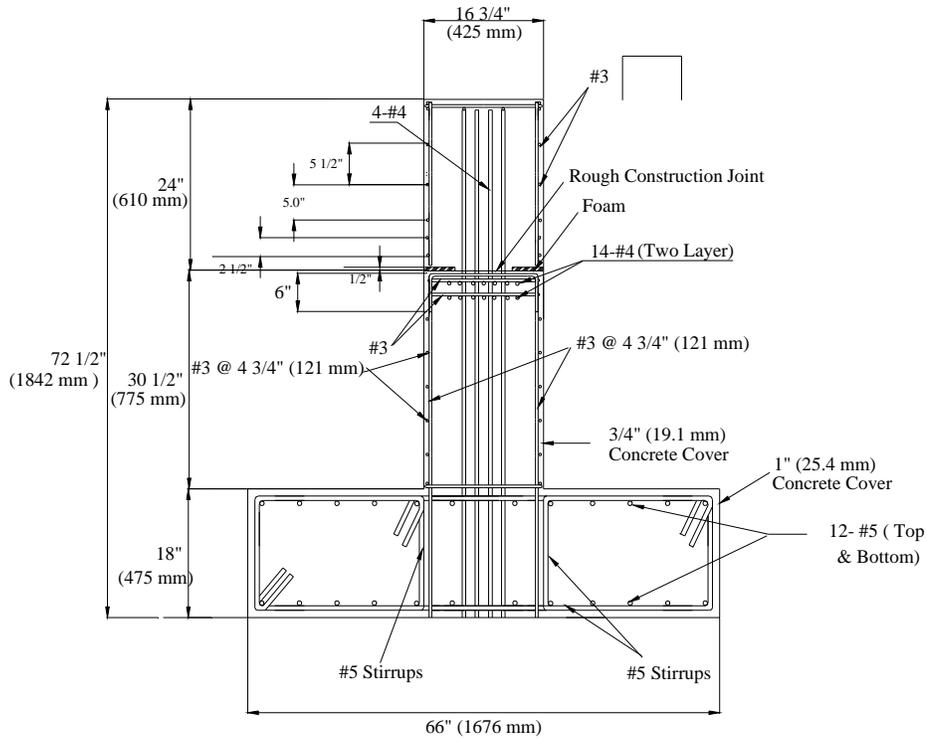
6- Reinforcement Layout (Section A-A)-Test Series V
